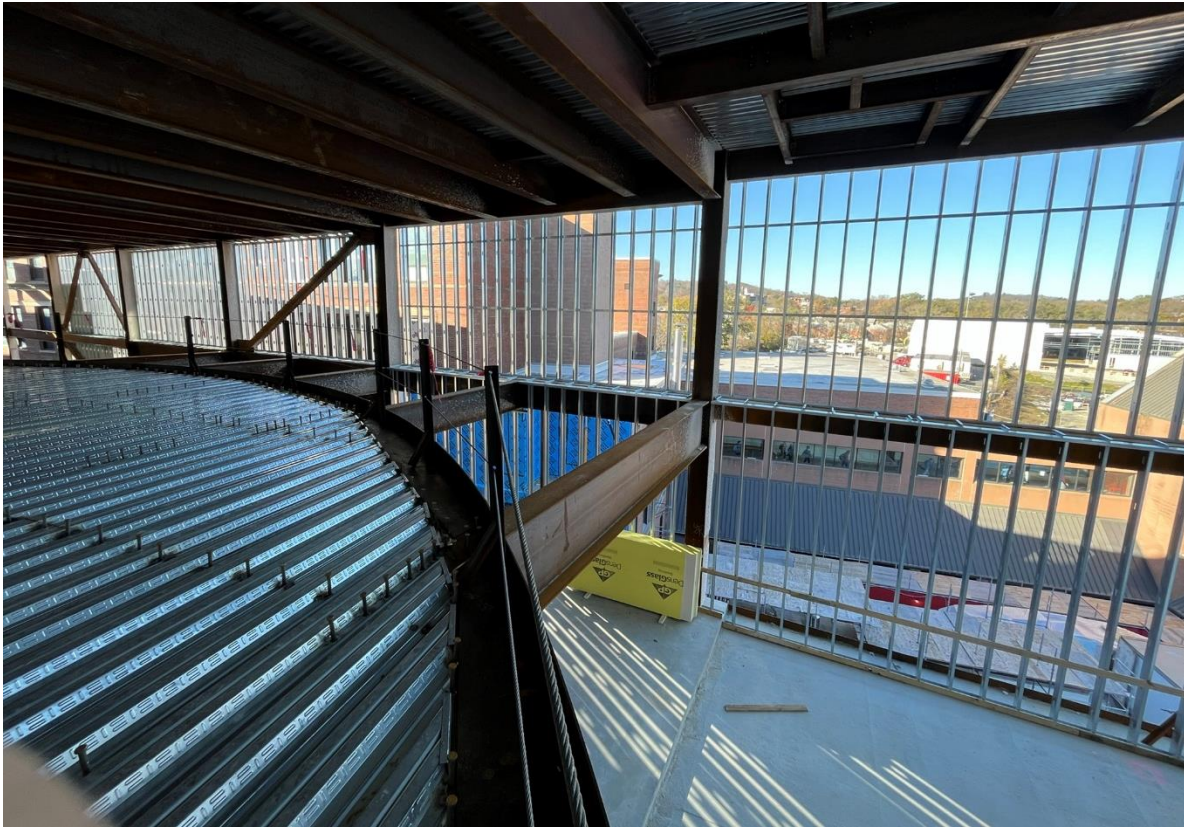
Steel for future Learning Lab looking down concrete slab of Media Center
